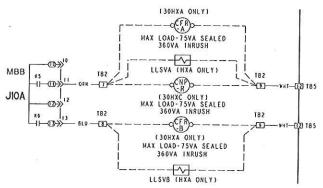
Condenser Pump Relay Wiring; 30HXC and Remote Condenser Fan/Liquid Line Solenoid Valve Wiring; 30HXA 115 or 230 V\
